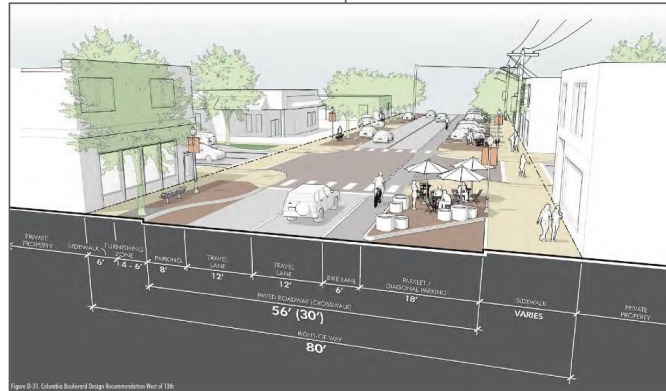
Columbia Boulevard Design Recommendation West of 13th
